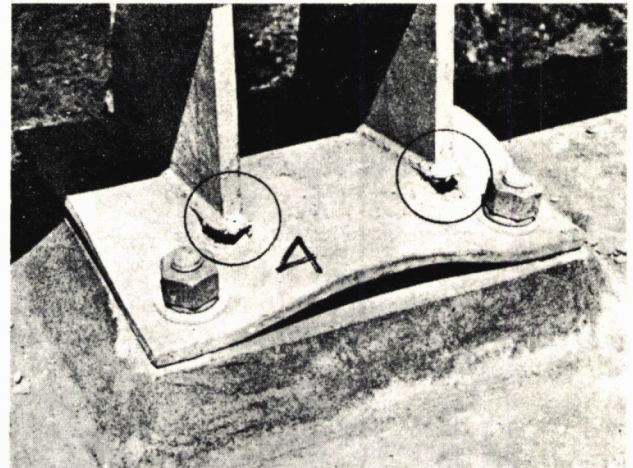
Localized fillet weld connection failures. (Note that the base plate is also deformed and the anchorage bolts were forced out of vertical alignment, which could possibly constitute a maintenance replacement problem.)
